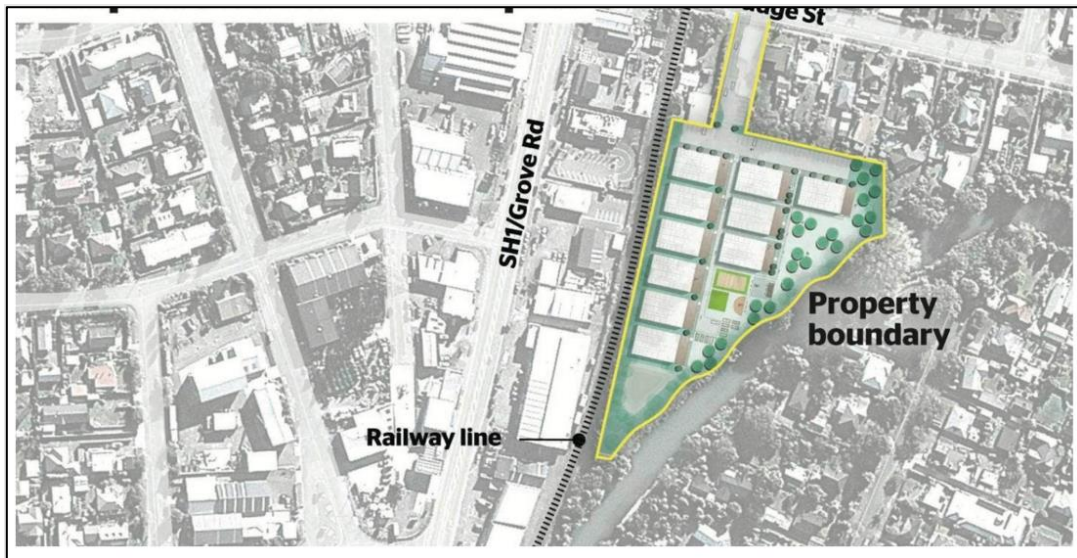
Multi Complex Site Plan - 36 and 36A Budge Street (Source: Eder, 2018)
